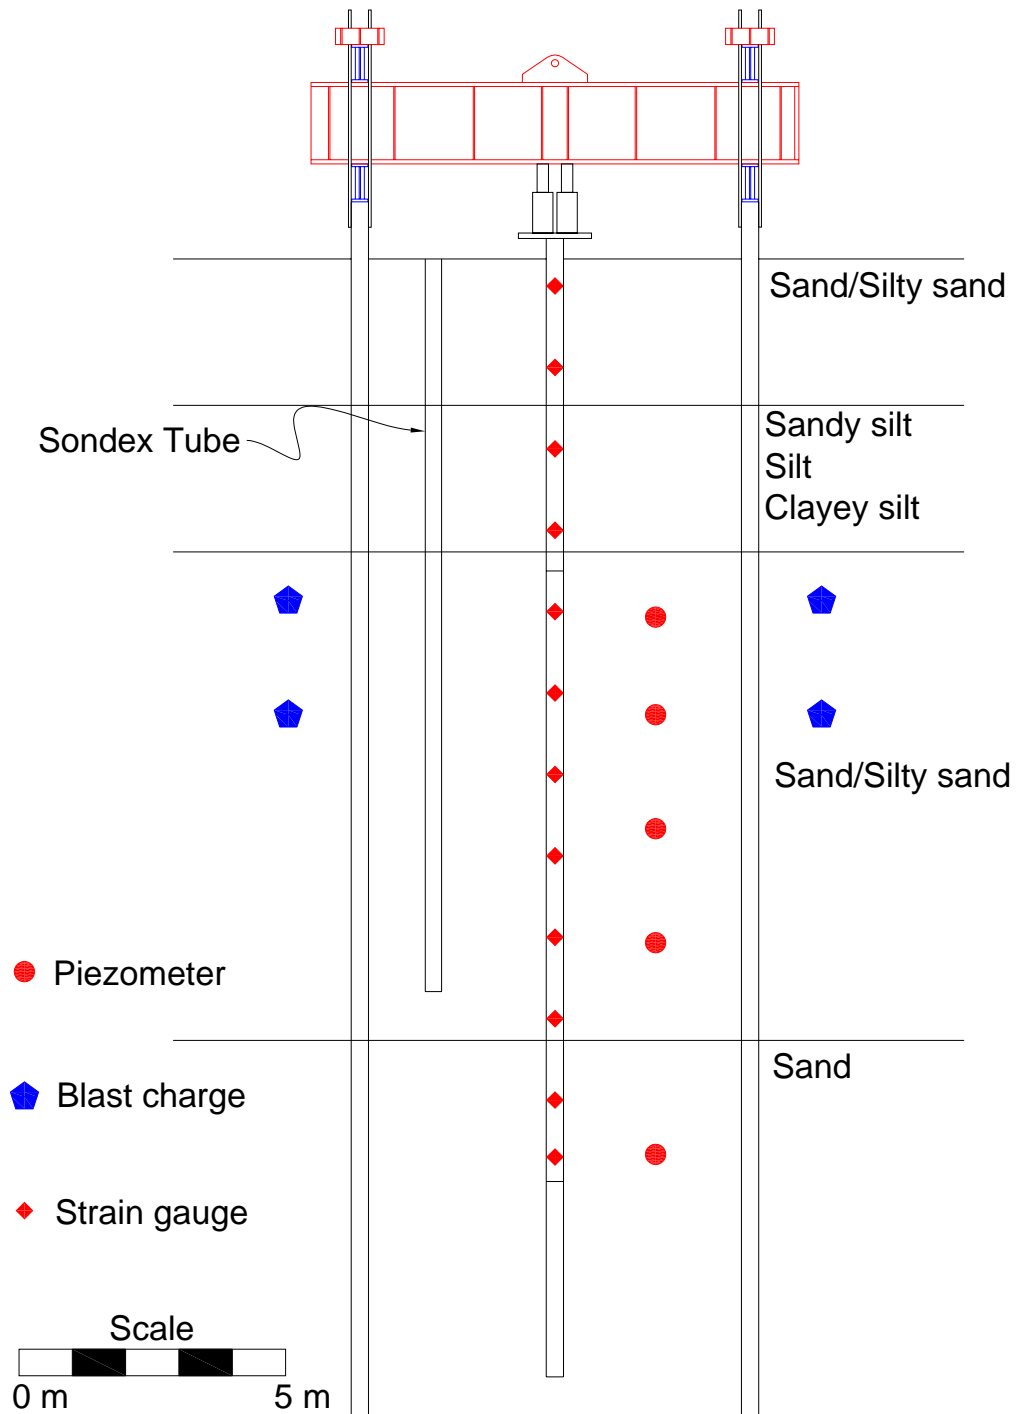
Profile view of pile foundation and instrumentation layout at Site 2.
